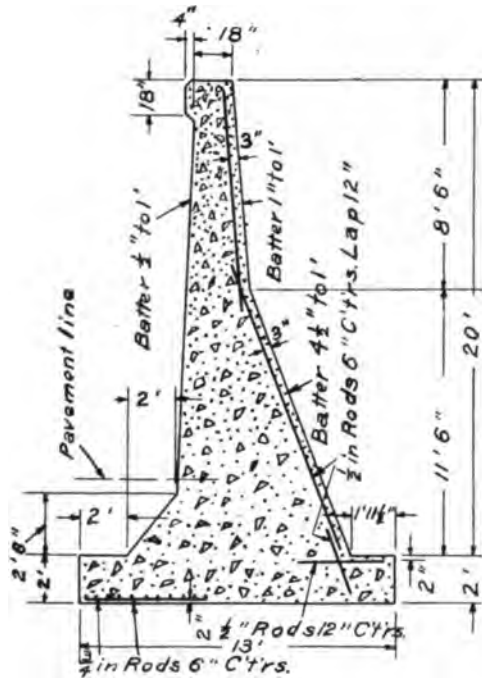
REINFORCED CONCRETE TYPE OF RETAINING WALL AS USED IN RAILROAD WORK.
